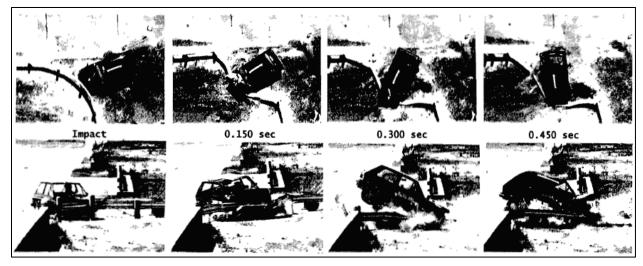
Sequential Photographs for Test 1263-1 (5).
